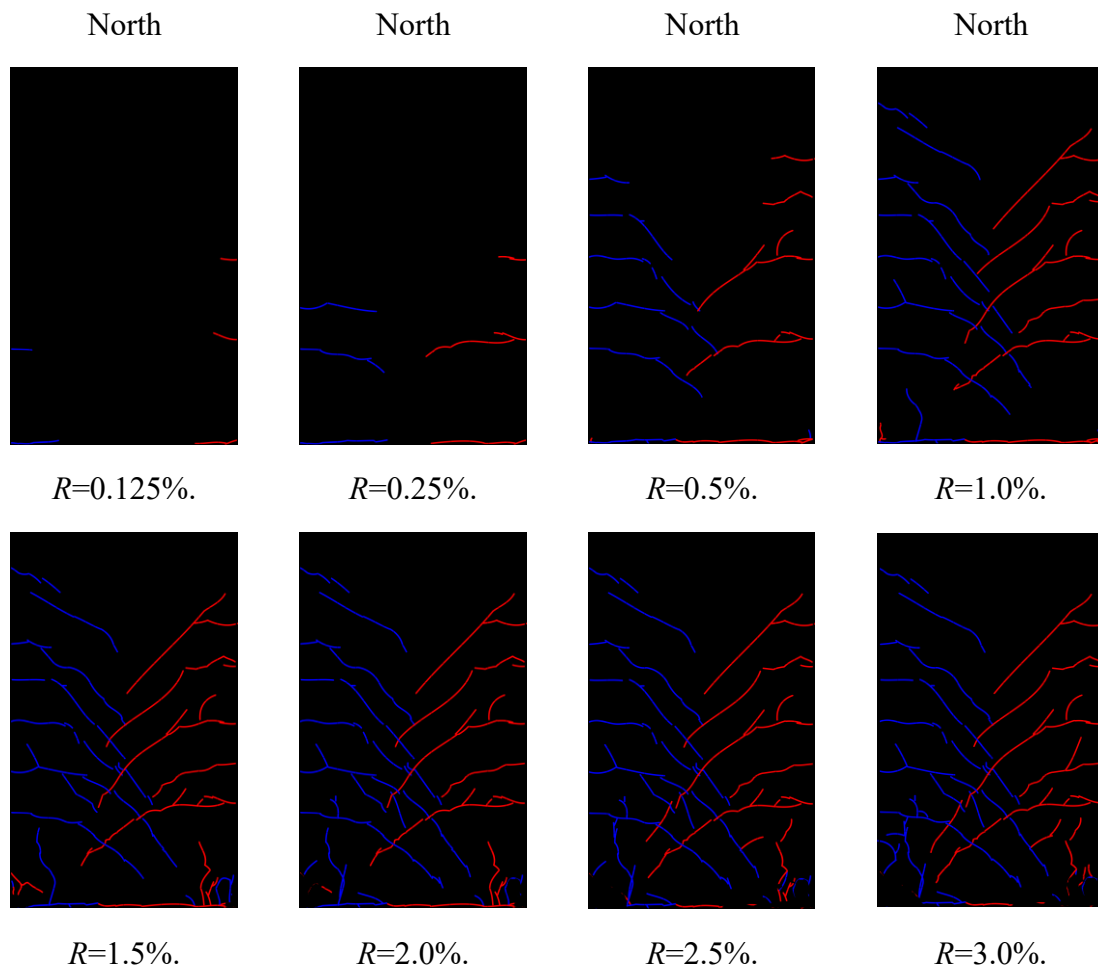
Cracks patterns observed on specimen WP20-D10H55P-075
